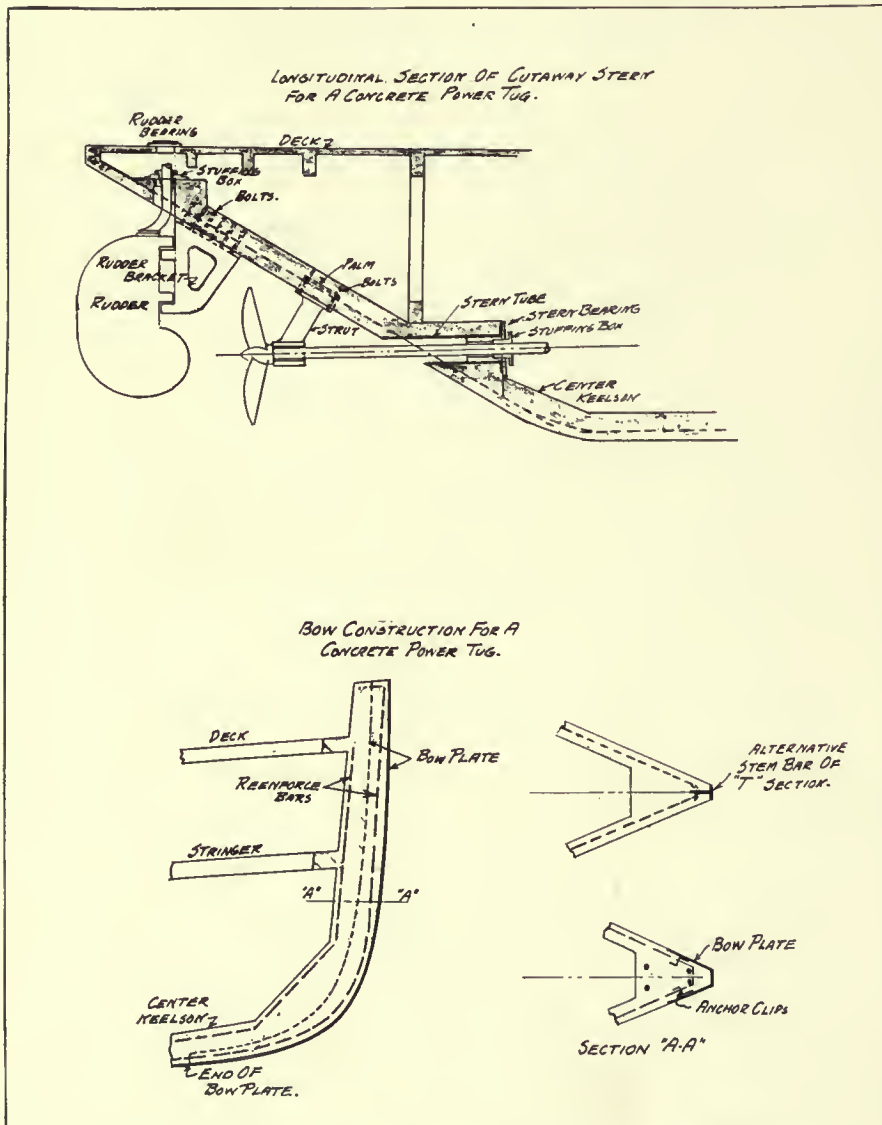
AND 109—BOW AND STERN CONSTRUCTION FOR A CONCRETE WORKBOAT
